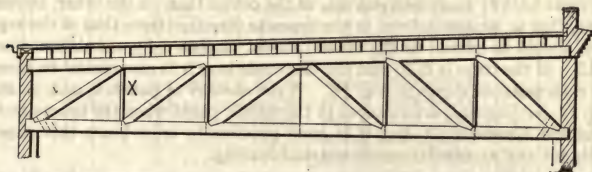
Six-panel Howe Truss with Top Chord Inclined
